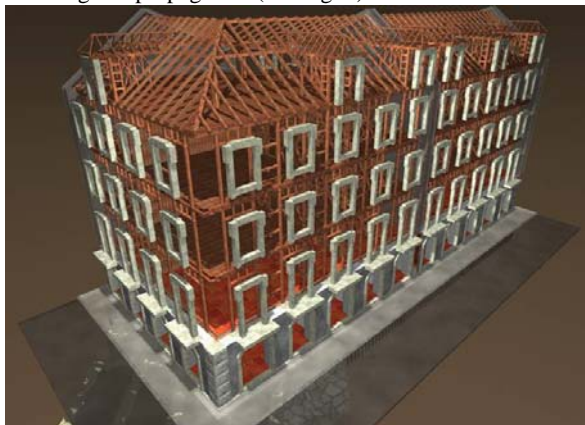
Virtual reconstruction of the Pombaline structures, (Silva, 1999)
